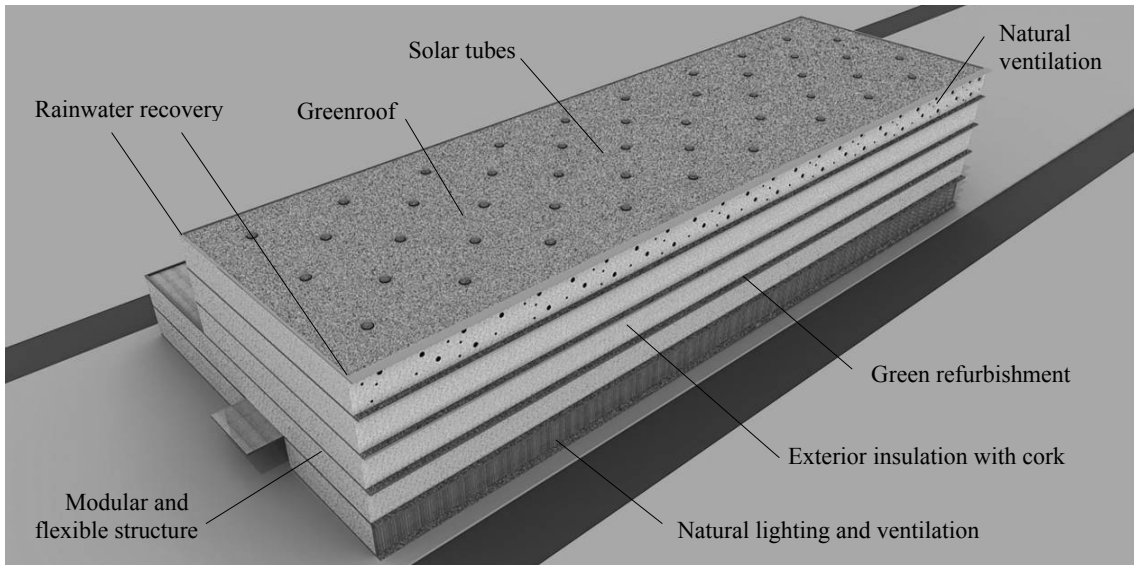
Architectural proposal for mill tandem and clarification warehouse.
